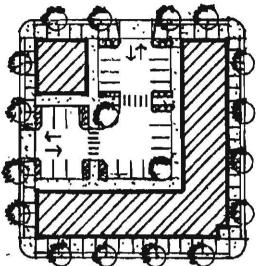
(A): Surface Parking - Parking Area Interior to Site
